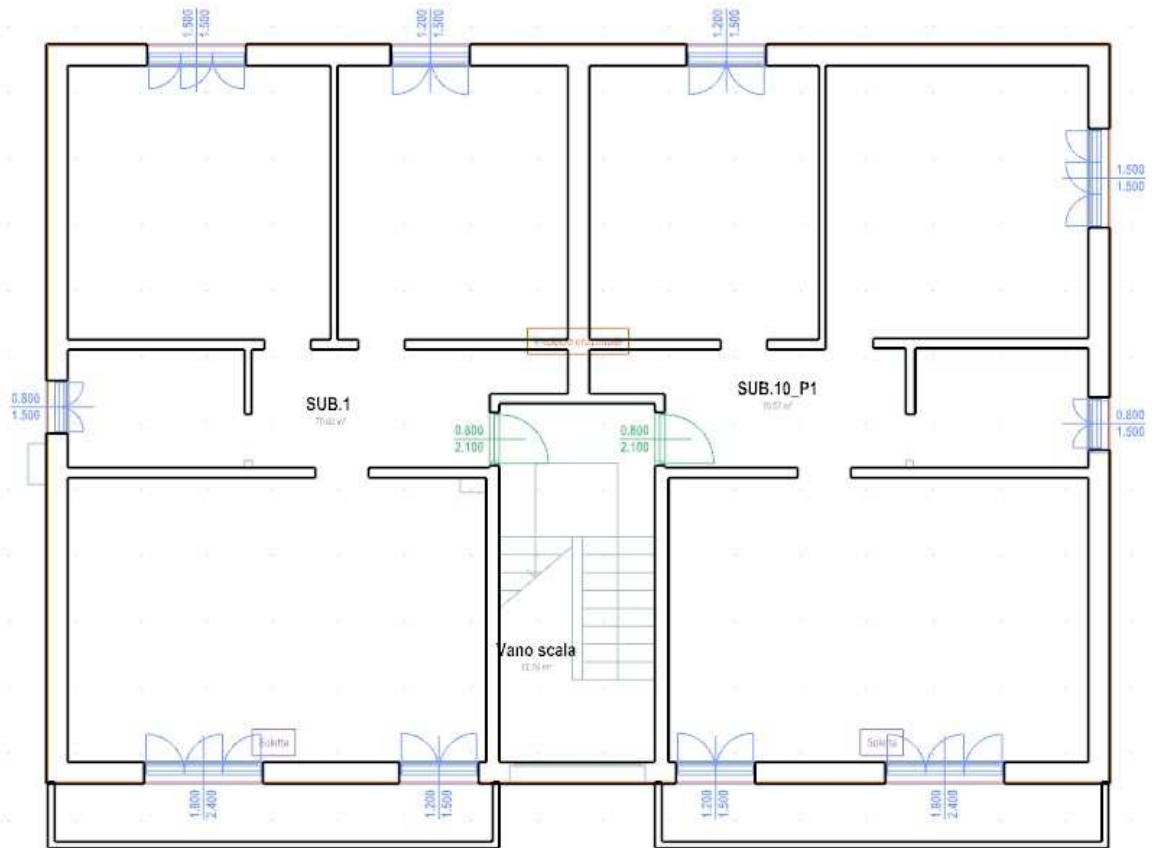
6 First Floor Plan of the Residential Building (Two-Family Unit Layout)
